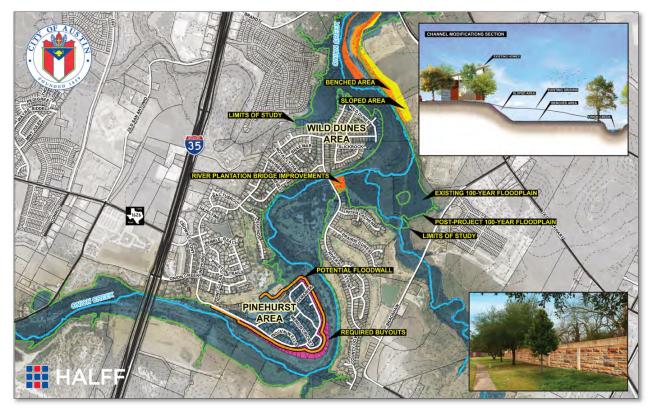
Schematic of Pinehurst Flood Protection Wall with Channel Modifications
